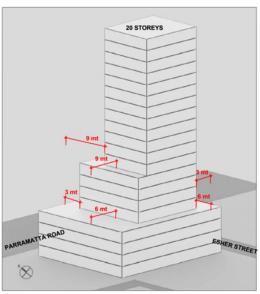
Extract from submission - Proposed envelope conceptual site massing for Nos.336-336A Parramatta Road (Source: Tony Owen)
